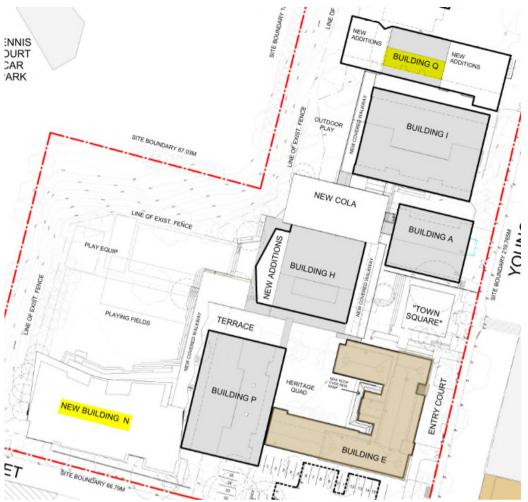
Site Context Plan with Buildings N and Q highlighted in yellow (Source: DFP Planning, February 2019)
